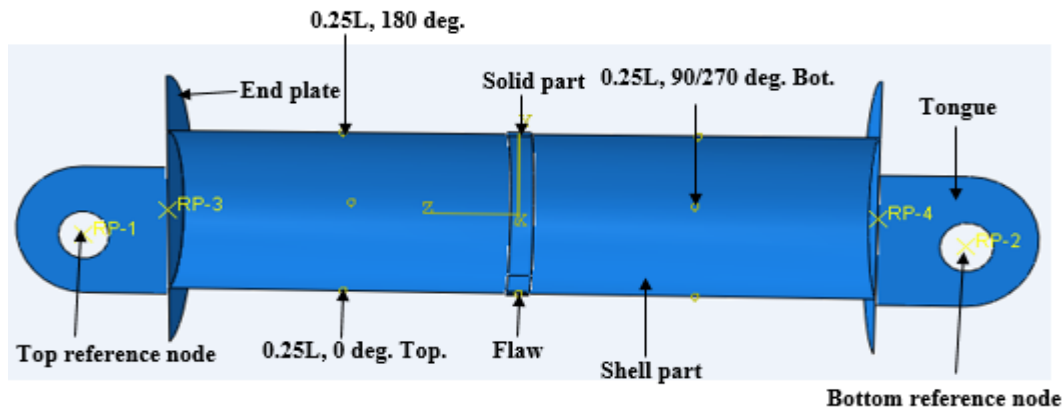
Assembled components of the model showing the geometry and reference points.
